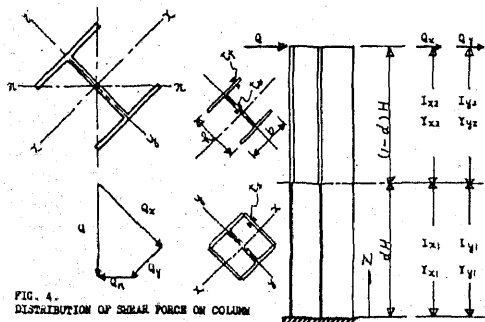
DISTRIBUTION OF SHEAR FORCE ON COLUMN
